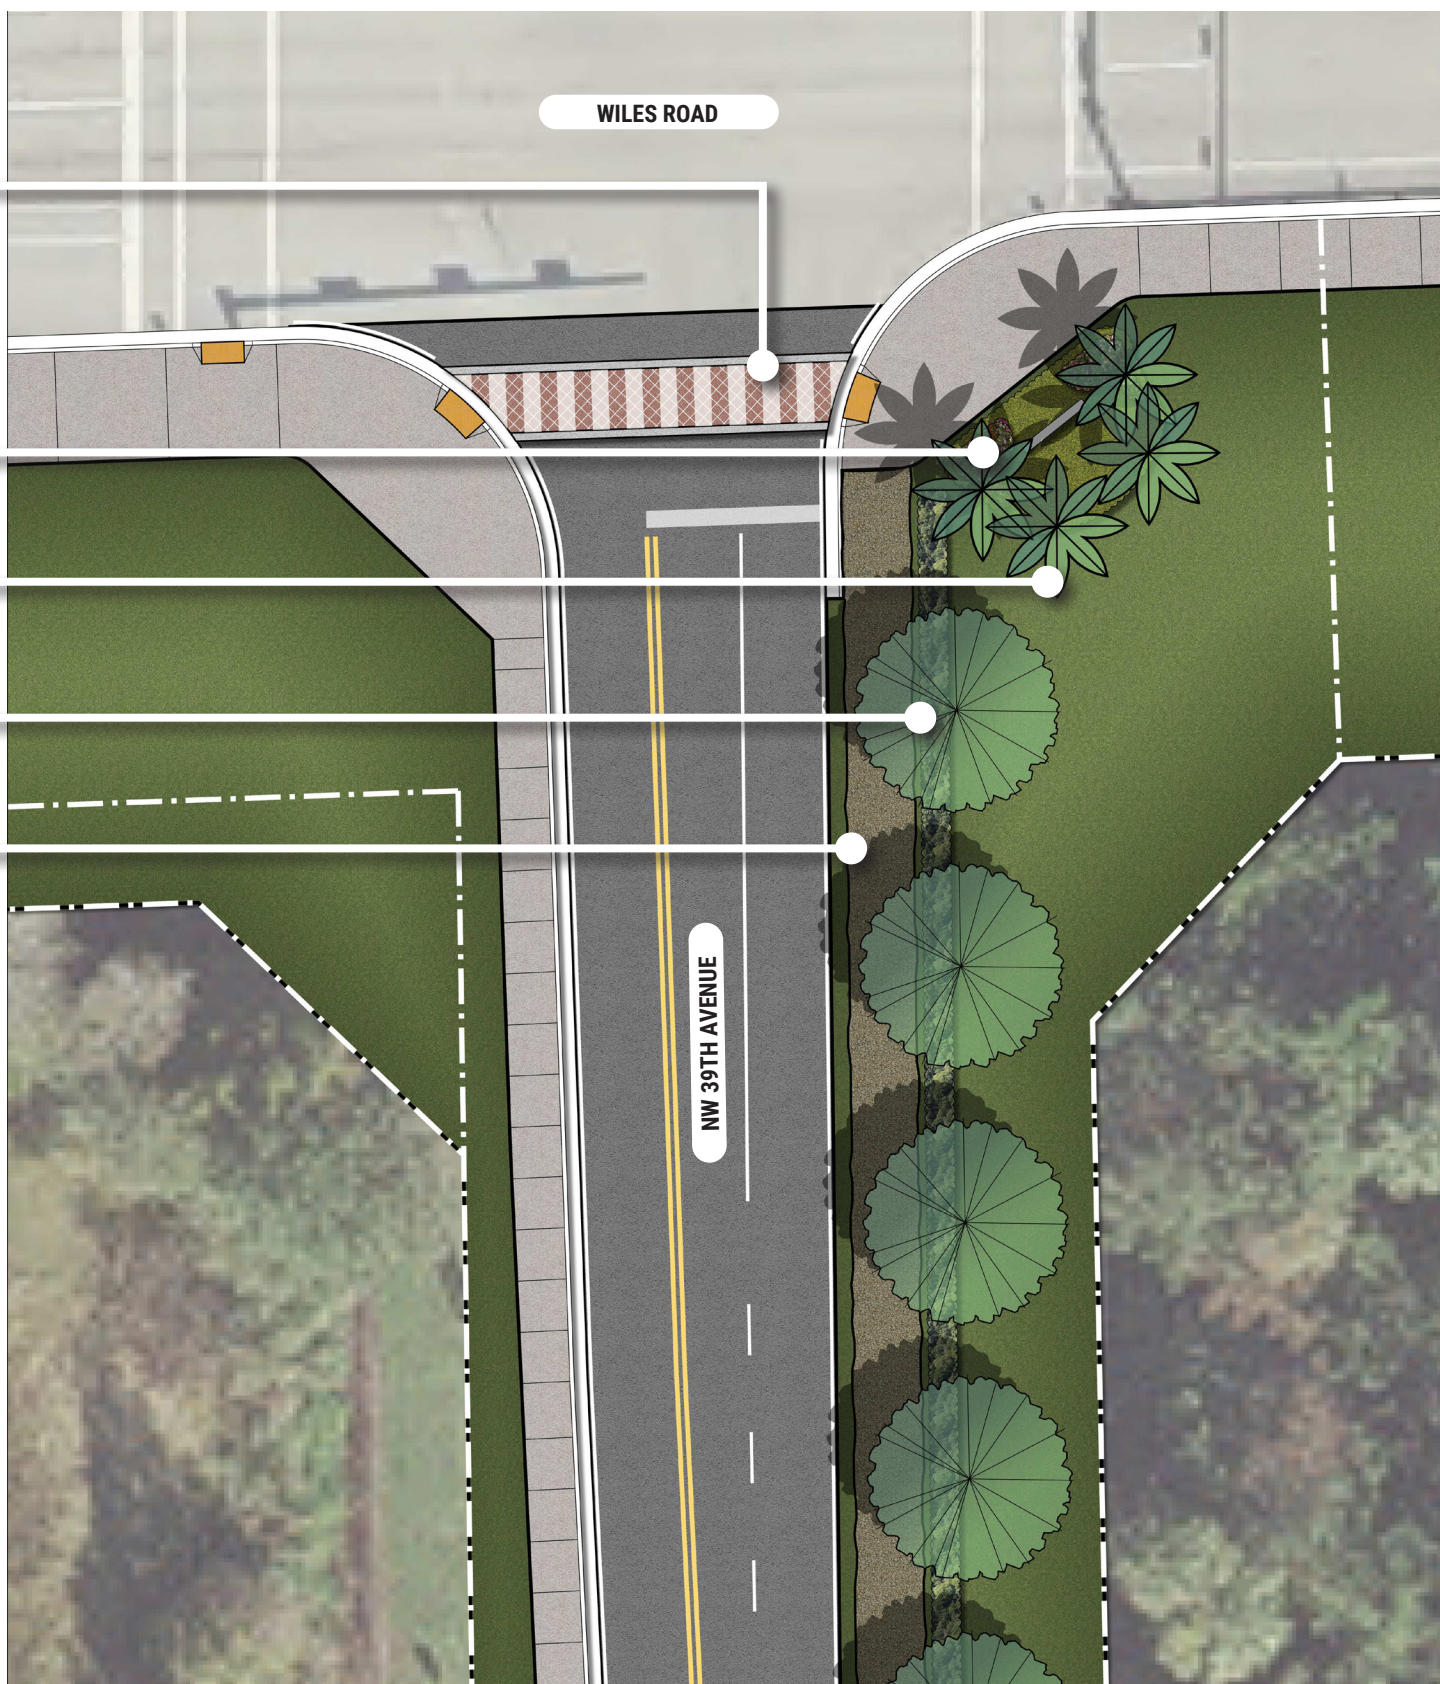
Proposed Concept Plan for Beautification at Neighborhood Entrance
